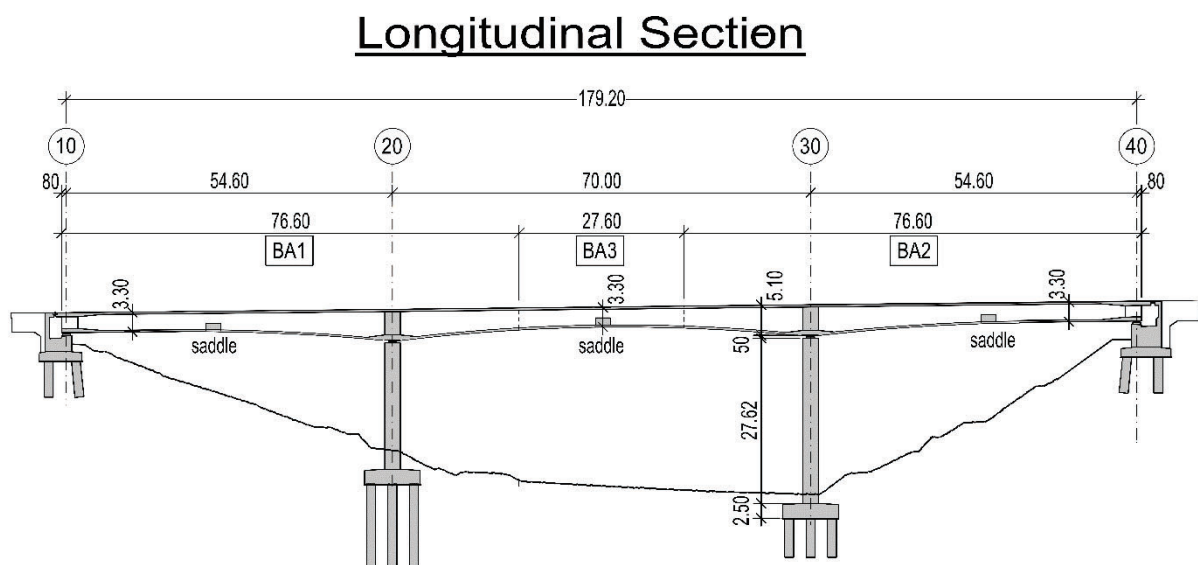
Longitudinal section of the TB Bechlingen with division of the construction sections © B+S AG
